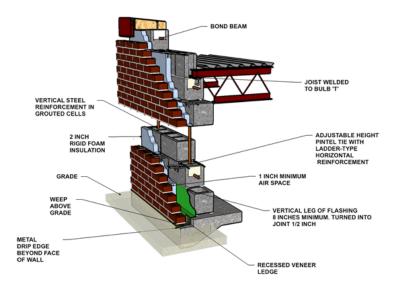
Schematic of brick veneer/reinforced concrete block cavity-wall
